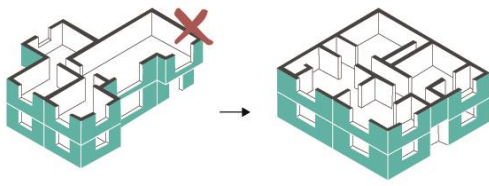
Regular plans are favourable above irregular plans (Adapted from Arup, 2014).
